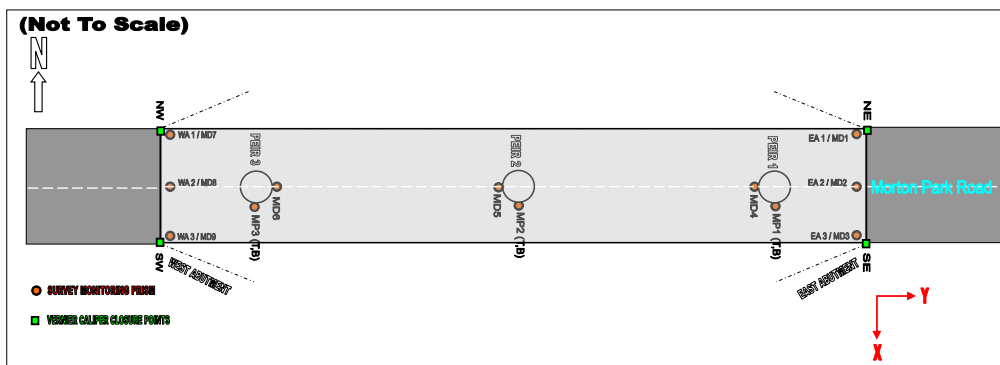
Plan of the Relative 3D Monitoring Points on the Moreton Park Road Bridge (South) (Courtesy of South32)
